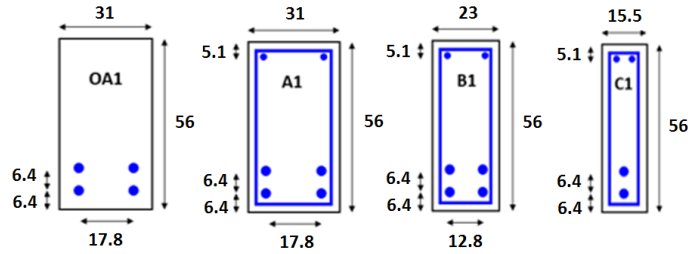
Sketch of the cross sections of the beams tested by Bresler and Scordelis (1963) (dimensions in cm).
